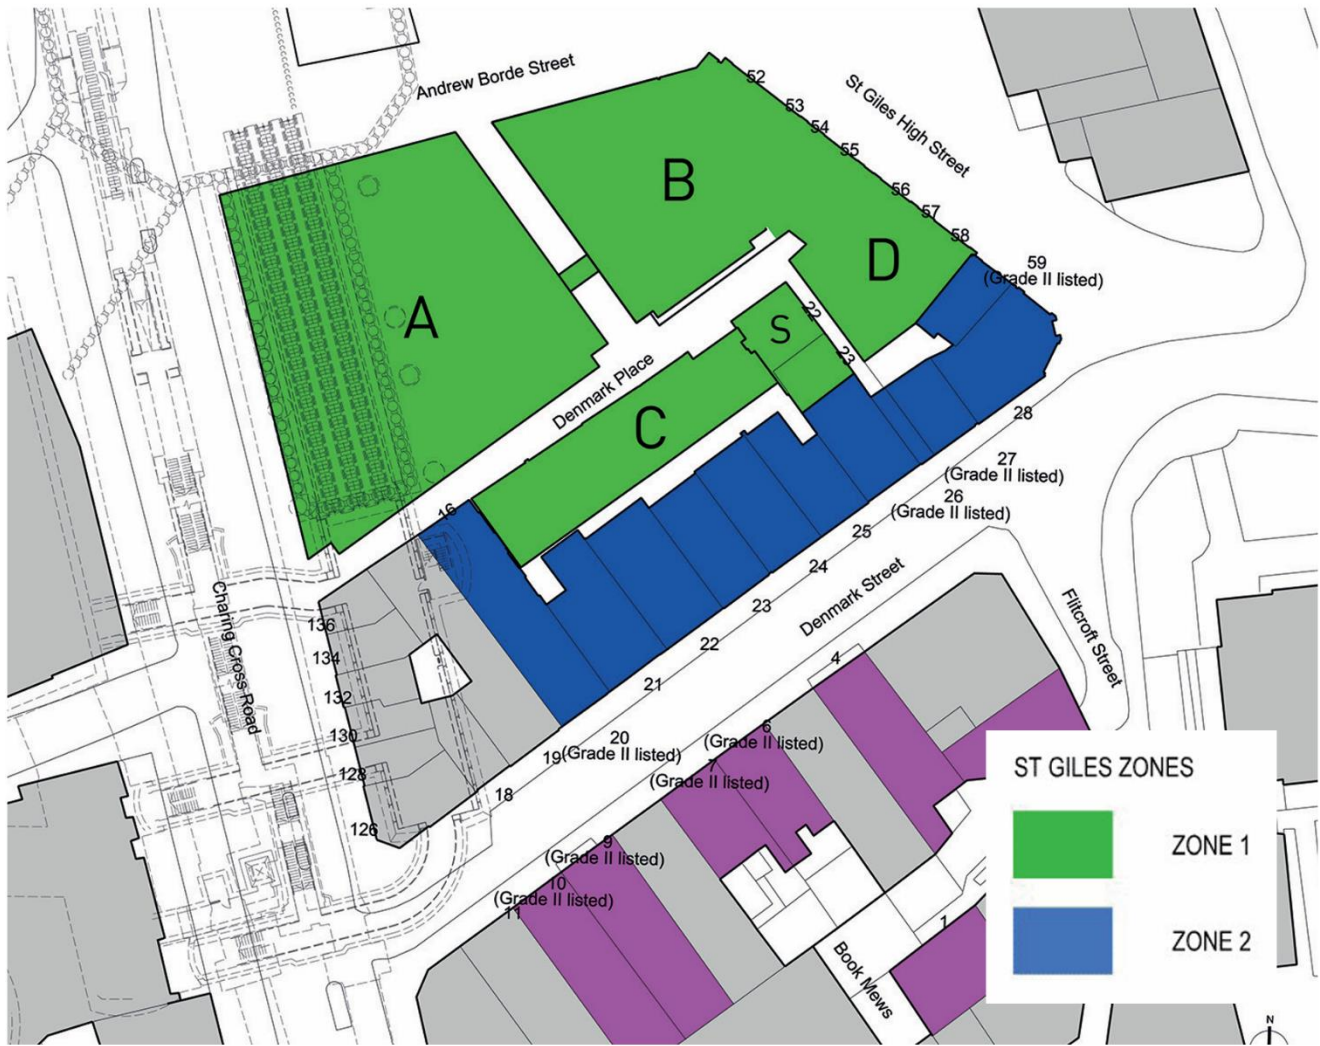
Site plan with listed buildings and extent of Zone 1 and Zone 2.
